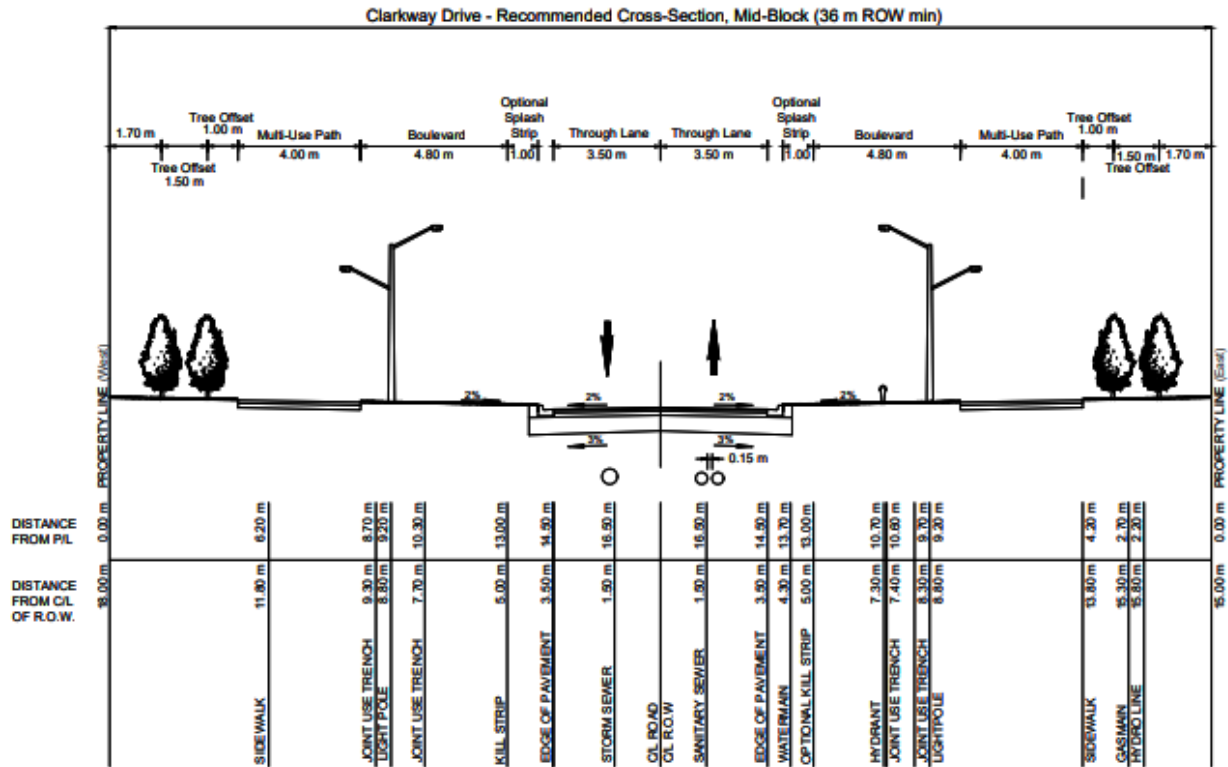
Recommended Cross-Section for Clarkway Drive: Countryside Drive to Mayfield Road
